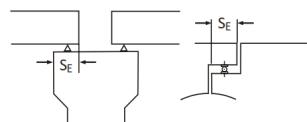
BRIDGE SEATS ON PIER TOP OR AT SUSPENDED JOINT
